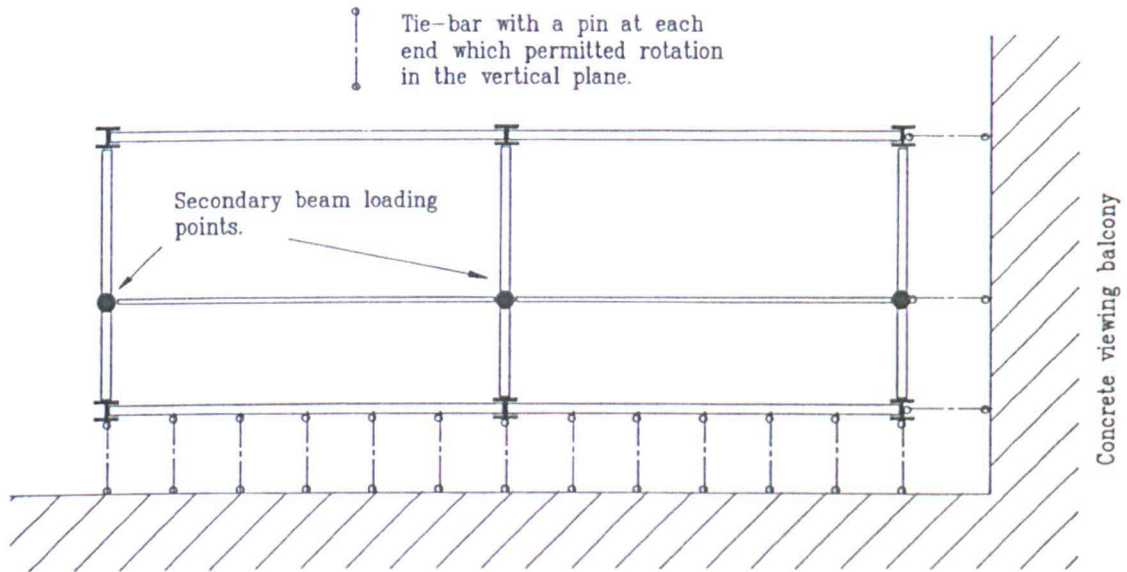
Typical plan view of frame indicating the position of restraint bars.
